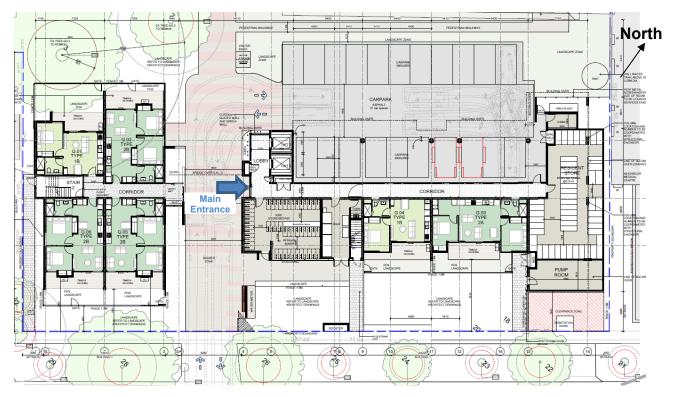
Ground level plan of the proposed Building 1 of the St Andrew's Bendigo Housing Development.
